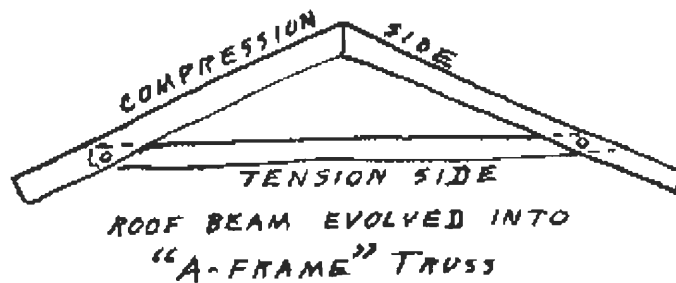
Roofs based on A-frames may use smaller beams, because they distribute load better. (Roberts, 53)
